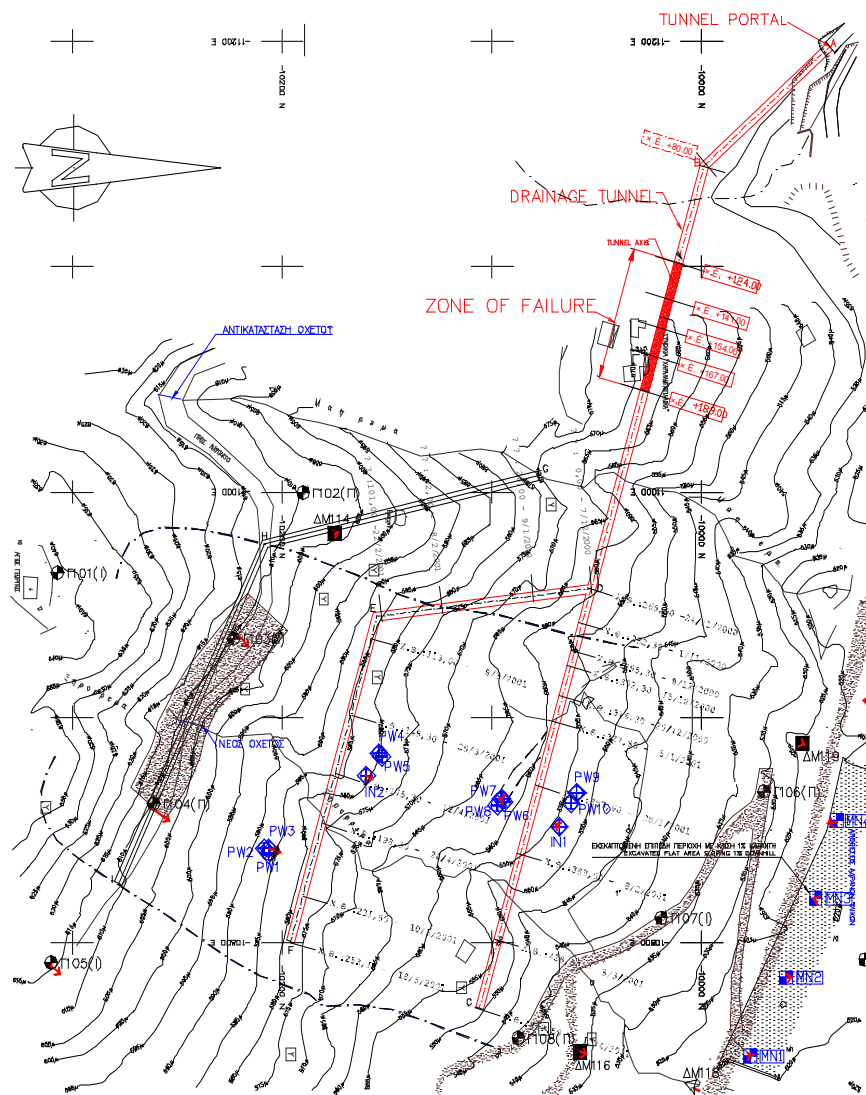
Plan view of the St. Dimitrios –Arachova drainage tunnel
